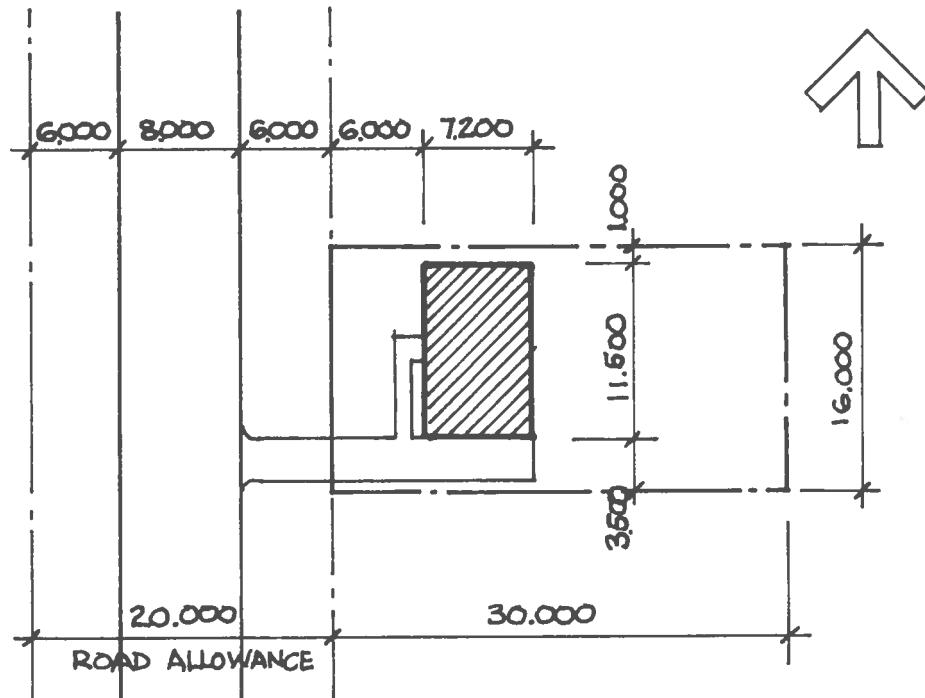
EXAMPLE OF PLOT PLAN 1:500
